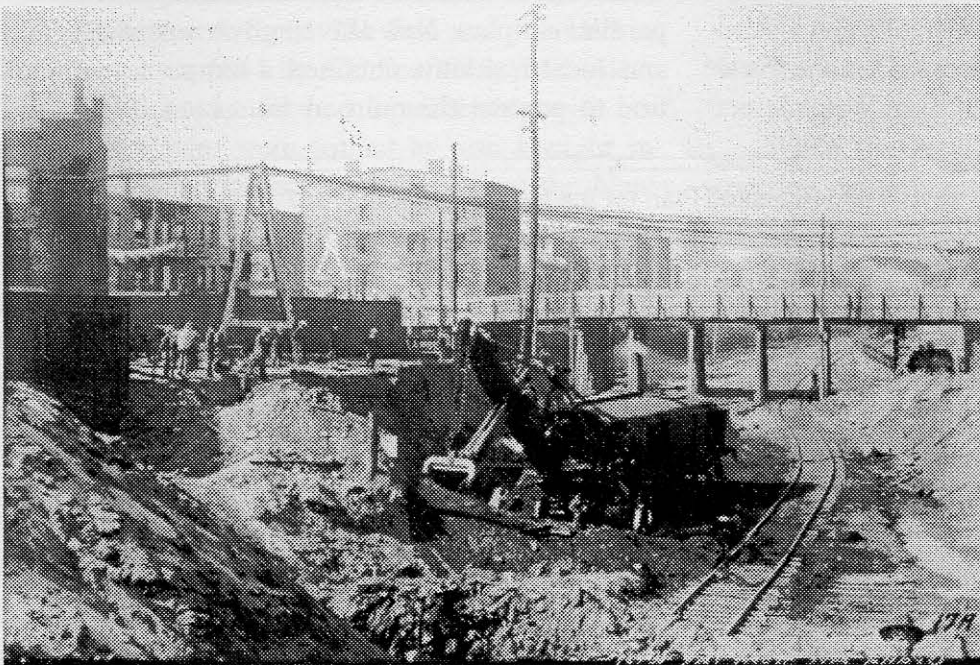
Looking north toward original Grand Avenue Bridge during widening of New Haven Cut, 1906. Source: Courtesy of Charles R. Harte, New Haven Colony Historical Society, New Haven, CT.
